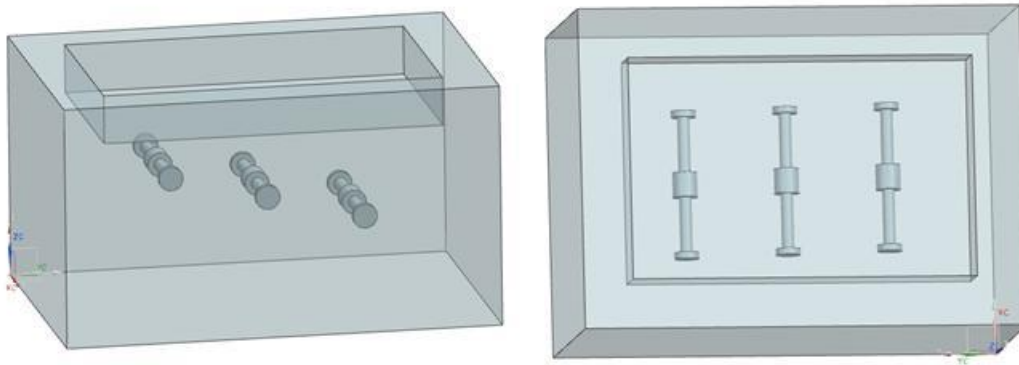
Outdoor slab construction. Side view (left), top view (right)
